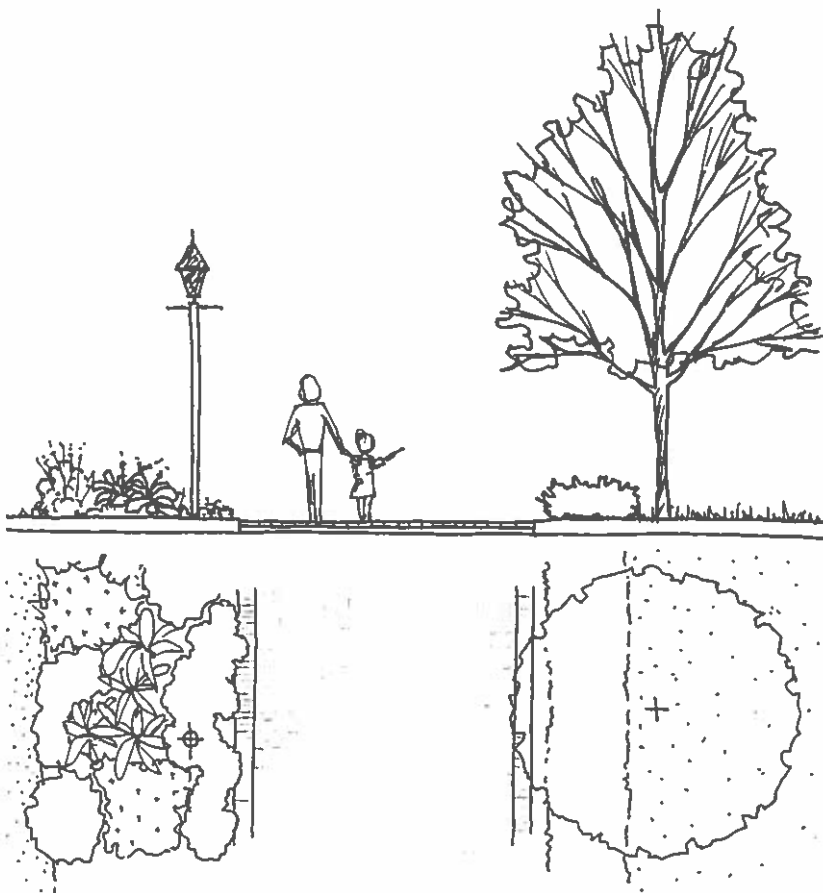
Planting concept to encourage strolling along Kent Green Walkway
